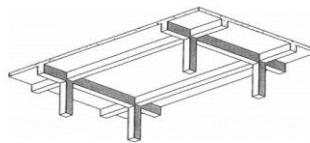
5. Beam supported slab system(Fanella, A; 2011)
